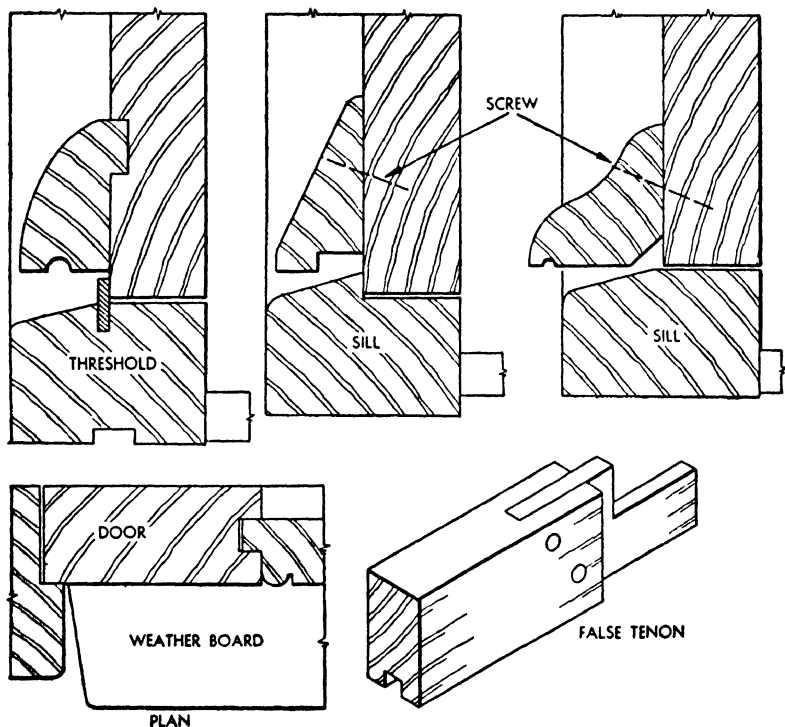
Methods of fitting weather boards to external doors. The boards should be splayed at one end as shown in the plan so as to avoid fouling the door jamb
